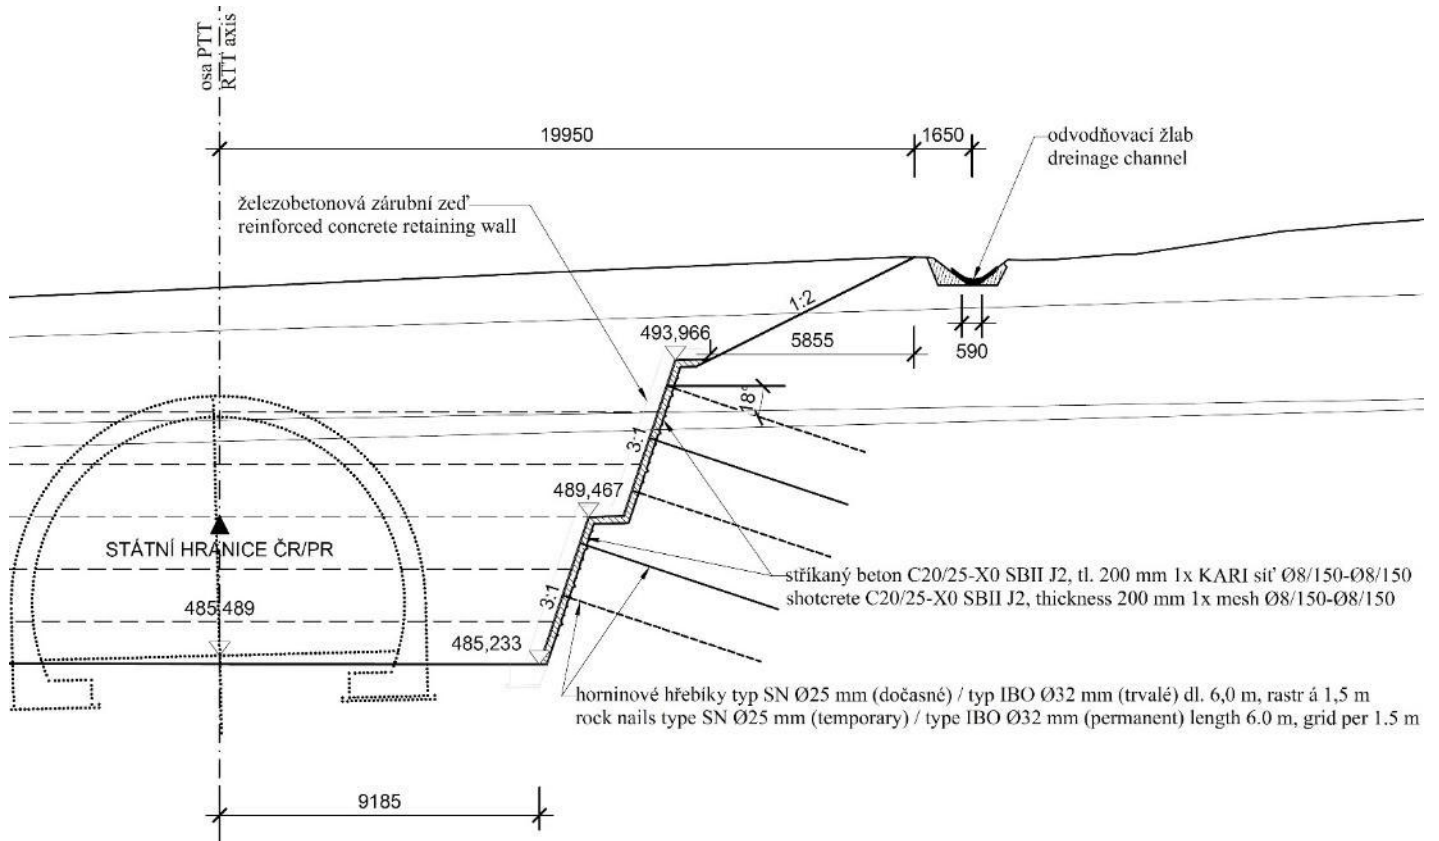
Cutout of a cross-section of construction pit support at the northern portal of the Opevnění tunnel.
